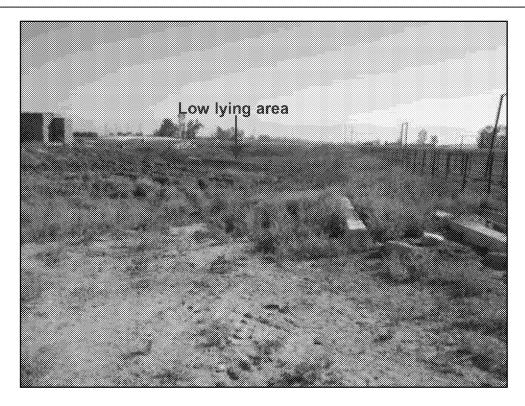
View facing east of the existing pond in the southwest corner of the Facility. Note the broken depth marker and vegetation growth in the pond bottom.
